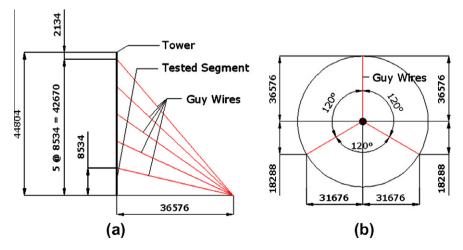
FRP prototype tower under investigation: (a) elevation and (b) plan (units in mm).
